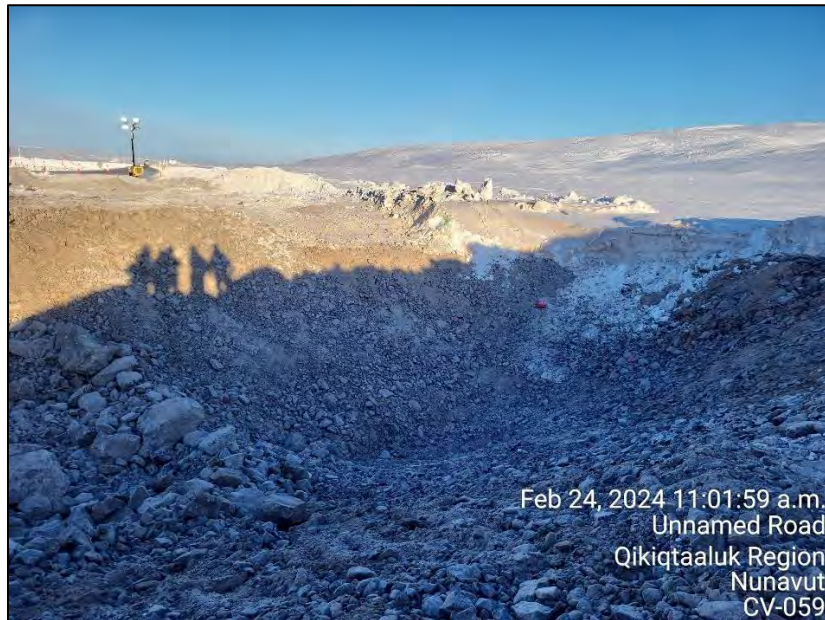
During Construction - Vantage Point 1 - Blast Excavation - Road crossing and upstream Inlet - looking south (February 24, 2024).
